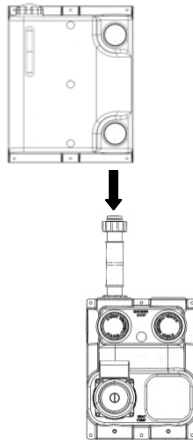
Flow center must be installed so that the pump's shaft is horizontal.
